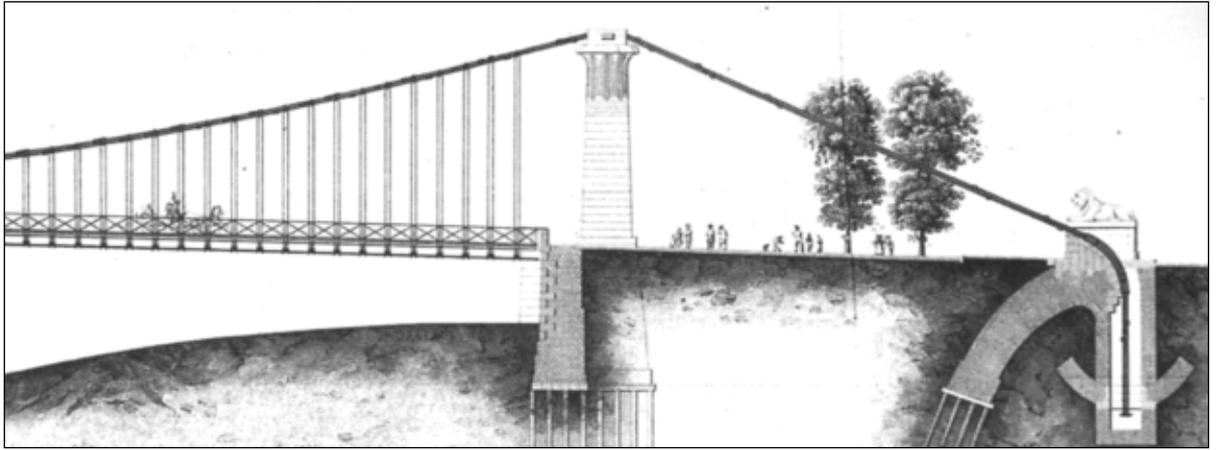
A portion of the bridge, as designed by Navier, showing the anchorage (see [13]).
